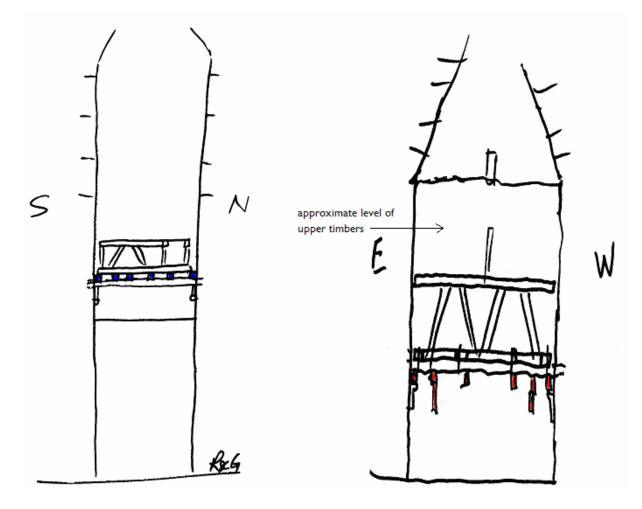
Sketch drawings which show the bellframe design, six supporting beams in blue on the drawing to the left, and lower in-situ timbers in red and approximate level of upper in-situ timbers marked on the drawing to the right (provided by George Dawson)
